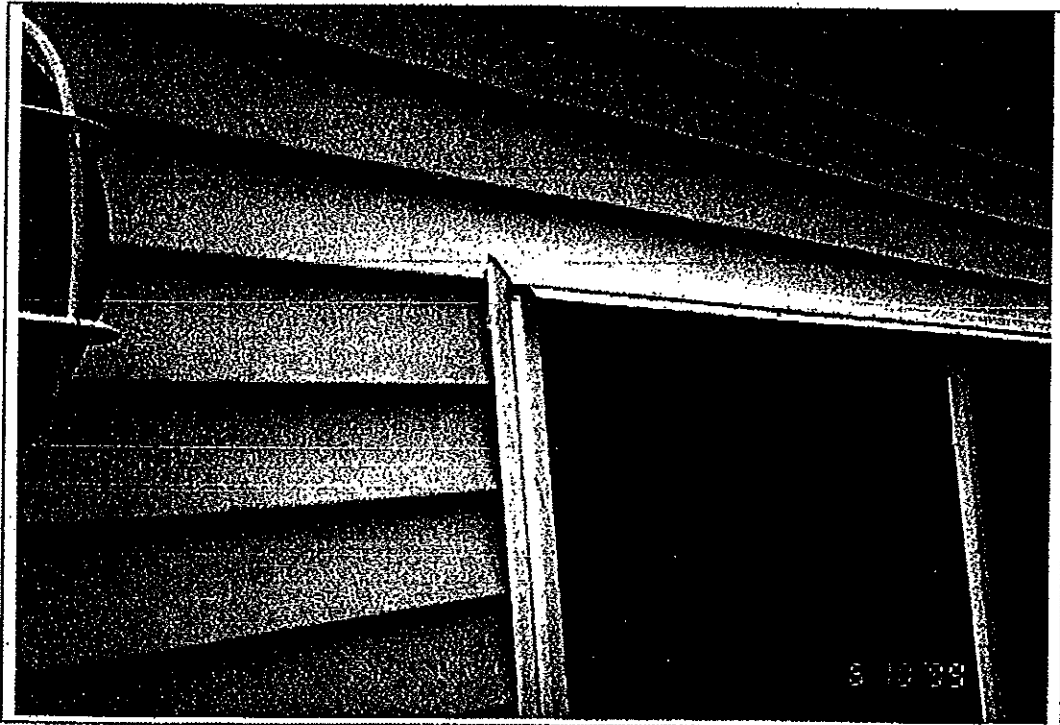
Typical window head flashing. Note the limited slope to shed water to the exterior and the lack of end dams.
